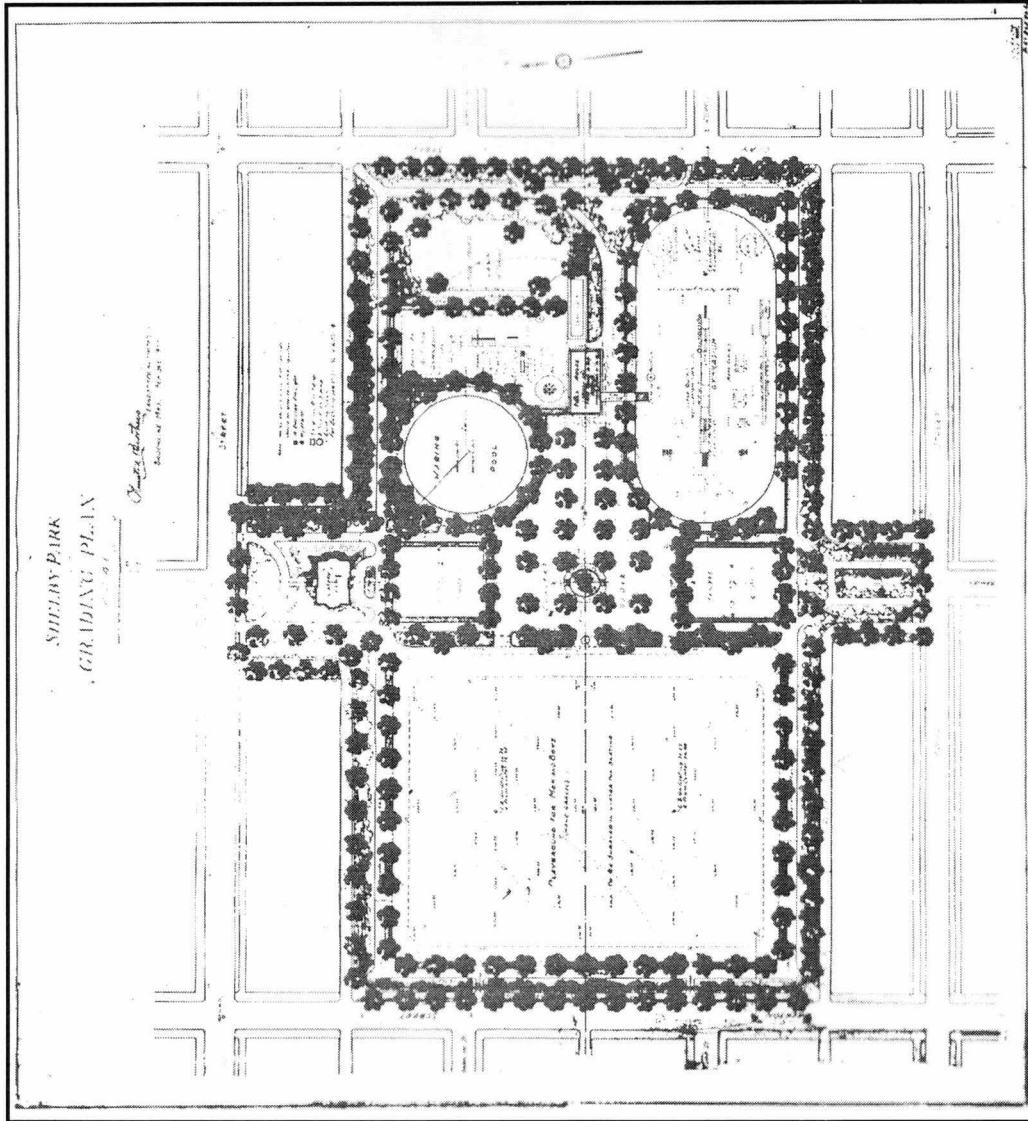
Shelby Park, Olmsted landscape plan (Kramer).
